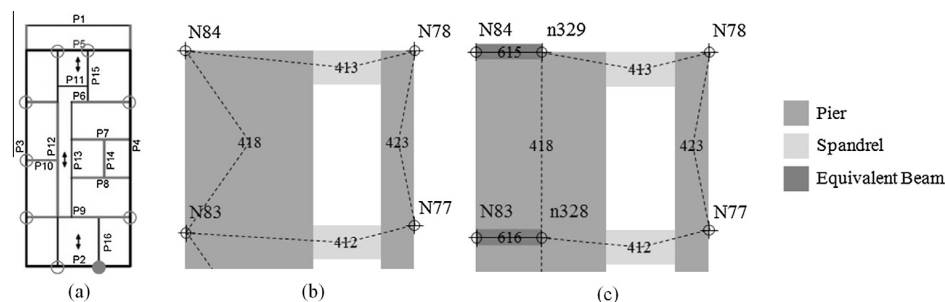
Connection between walls: (a) identification of the walls and example of wall P16 on the 4th floor, (b) original model and (c) equivalent beams at the floor level.
